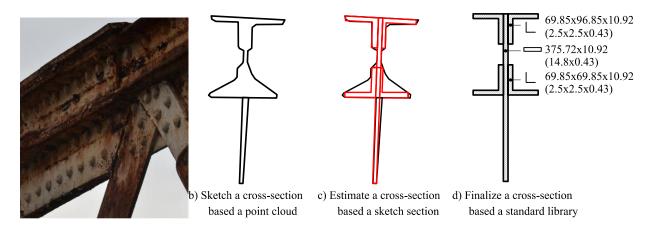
Evolution of point cloud to a final cross-section of the top chord (Note: value in brackets 603 is in Imperial units). a) Photo of a bottom chord; b) Sketch of a cross-section outline based on a 604 point cloud; c) Estimate of a cross section based on the sketched section; d) Finalised cross-section 605 based on a library entry
